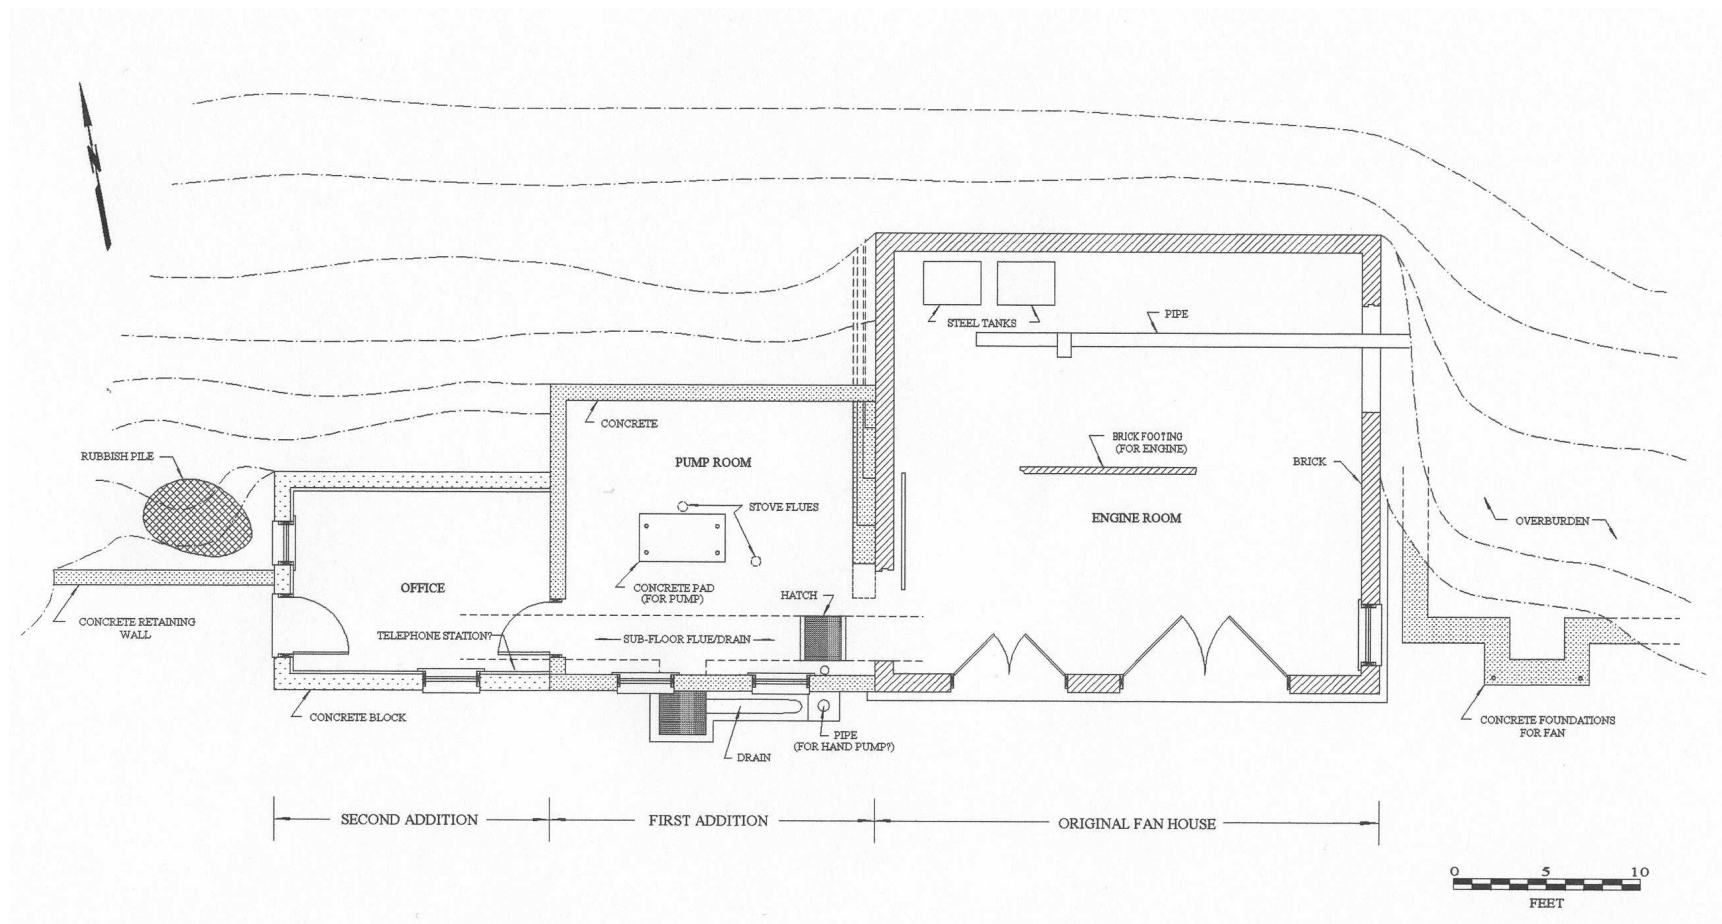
Floor plan of the Winston Tunnel Fan House, showing existing conditions (FRR 2003).
